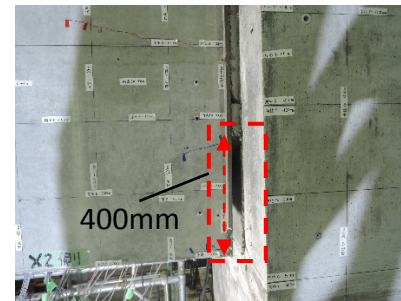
Joint mortar spalling at the South end ( $R=2.0\%$ )
